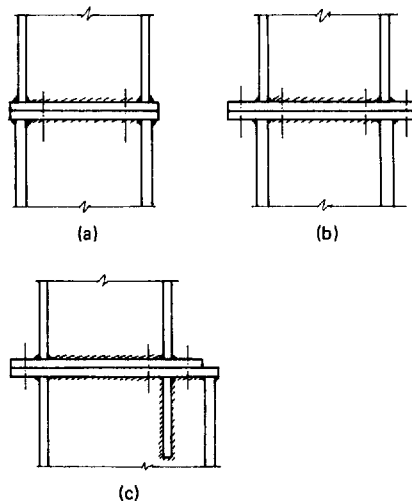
Column splices using end plates. (a) Similar sections, low moment; (b) similar sections, high moment; (c) different serial sizes, high moment
